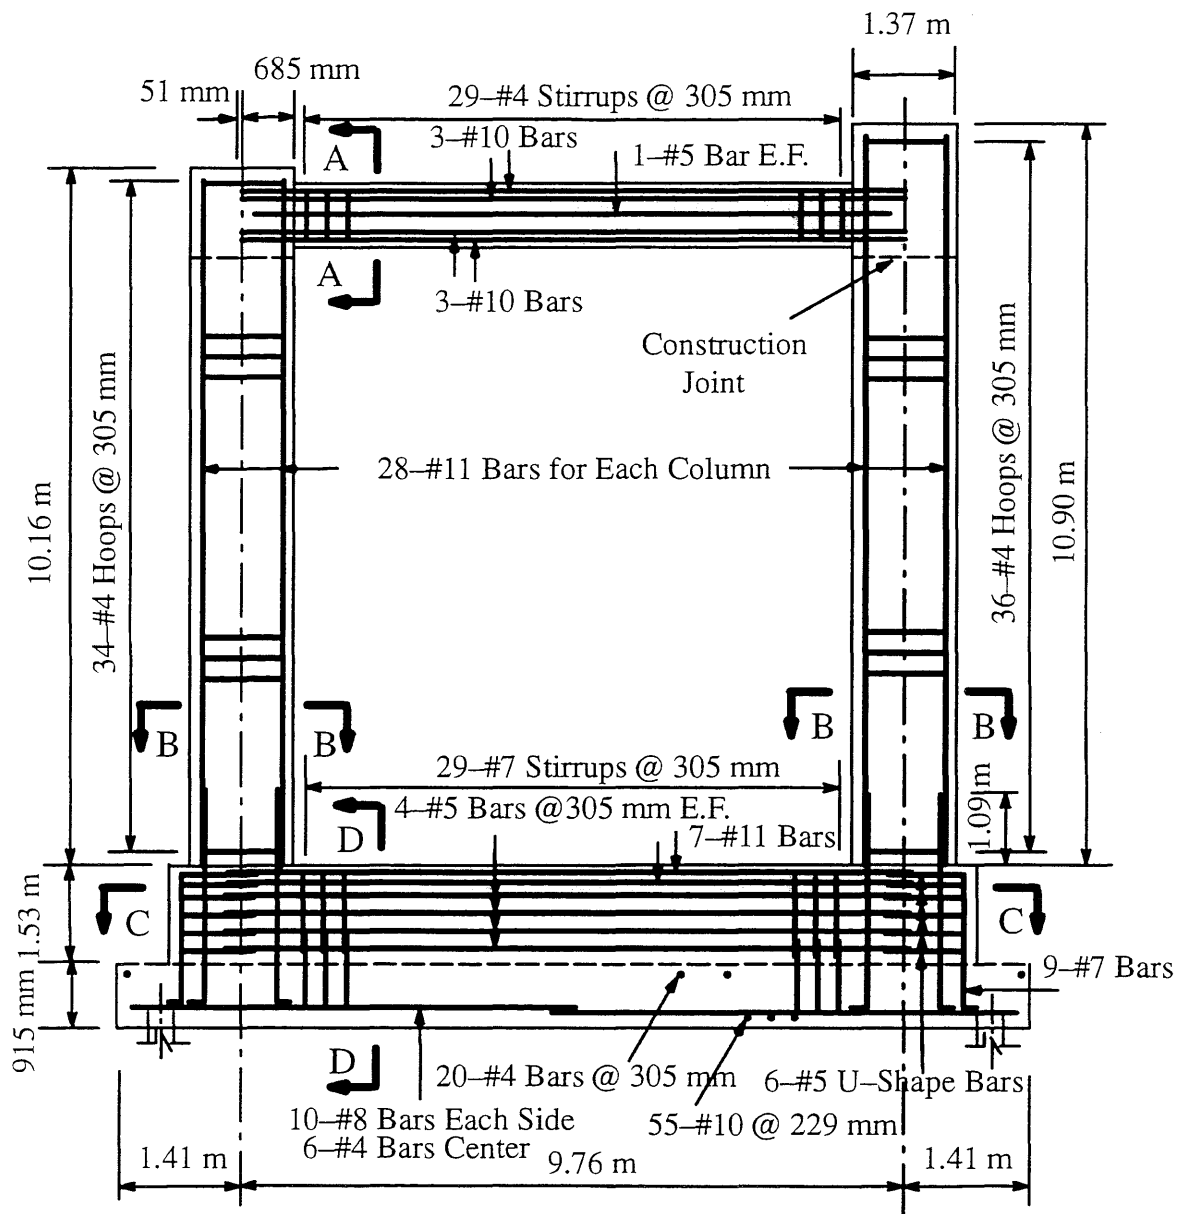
Reinforcement Details for Characteristic Pier with 1.37 m (54 in.) Columns
